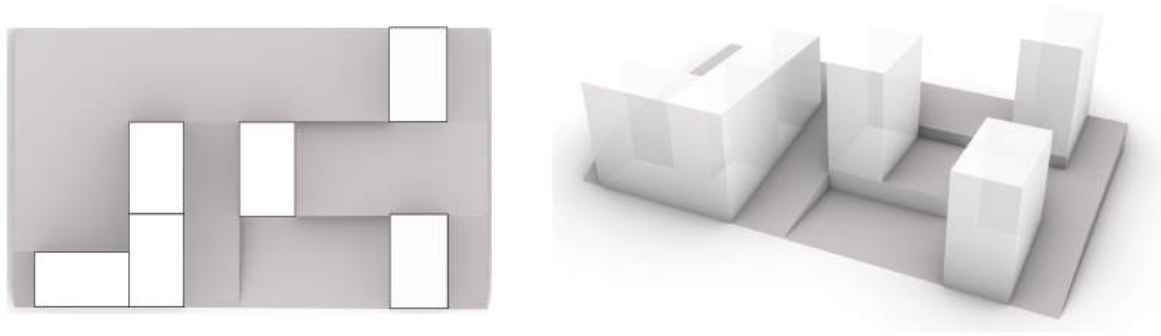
A 3D model and plan of a 6-building urban complex.
